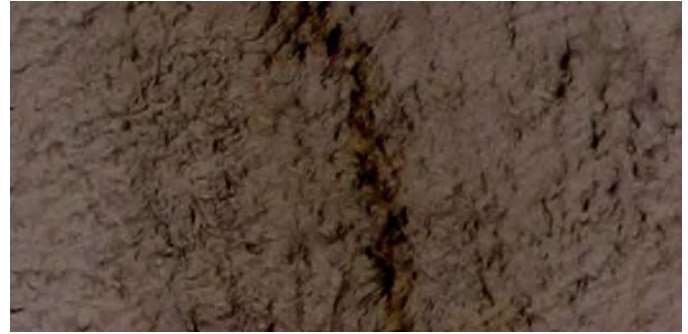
Close-up view of shotcrete crack on left wall by southern portal: detail of surface roughness.
